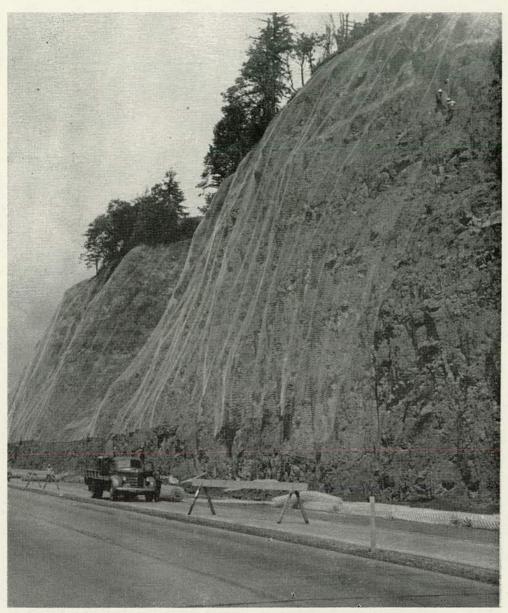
Wire mesh used to control rockfall near Kelso, Wash. The mesh is made of No. 9 wire and is intended to prevent rock from this 170-foot-high slope from plunging onto the highway. The rocks continue to come down, but are held against the slope and drop harmlessly into the ditch (Day, 1953). (Photograph courtesy of American Hoist and Derrick Company, St. Paul, Minn.)
